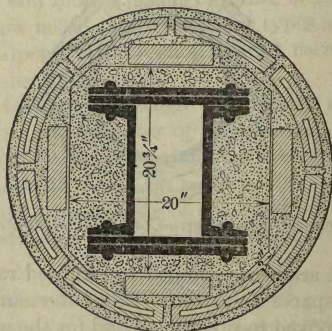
Column Protection, Adams Building, Chicago. — Holabird & Roche, Architects.
